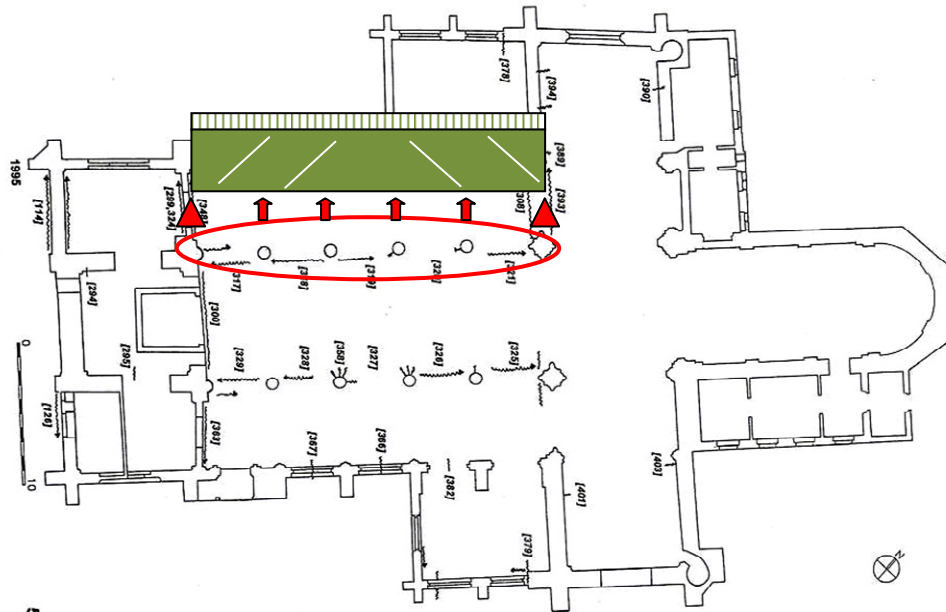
Stiffening concrete column and steel trusses against crossing columns in transept
